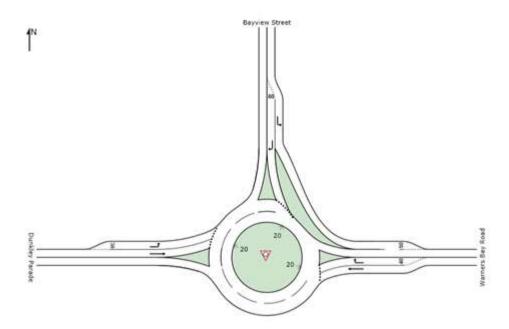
Warners Bay Road, Bayview Street, and Dunkley Parade roundabout
